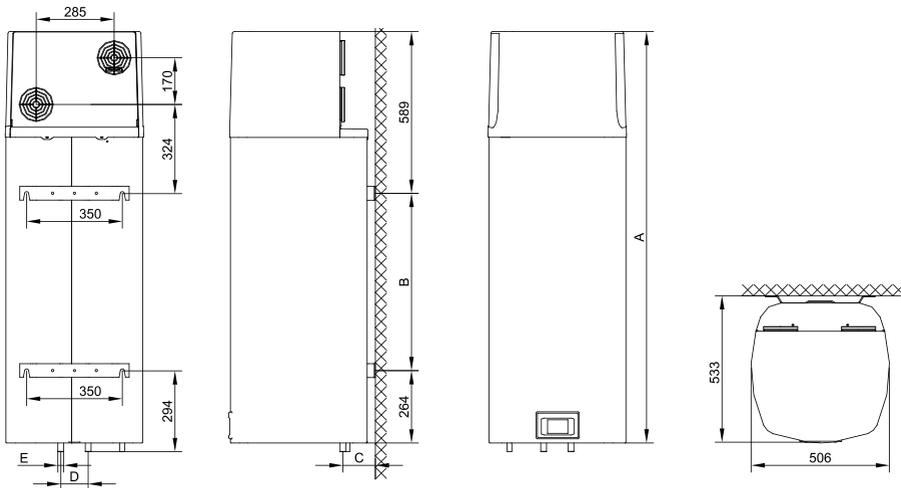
Connection and installation dimensions of the heat pump [mm]
